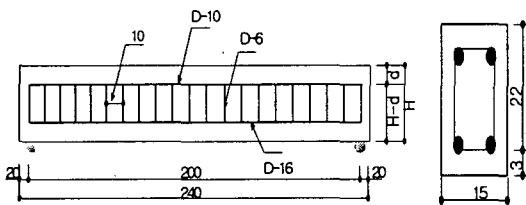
Detail of R.C. Beam Specimen (unit : cm)
